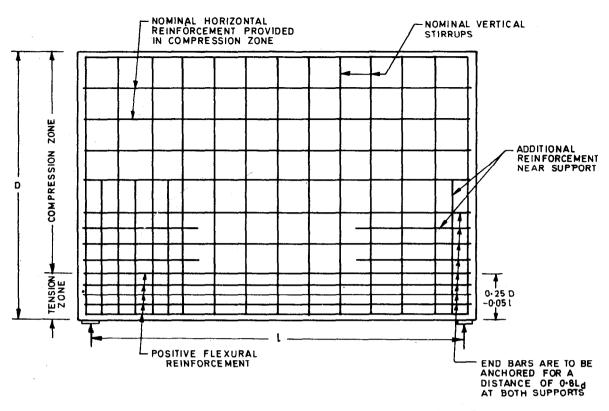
Reinforcement Detailing in Simply Supported Deep Beams
